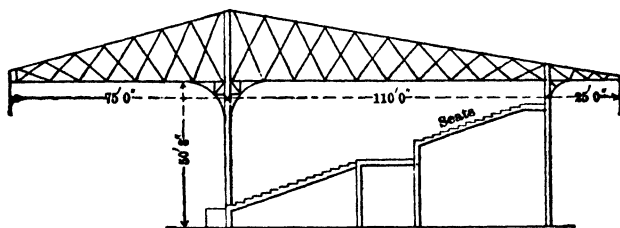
Cantilever Truss, Grandstand, Monmouth Park, N. J.
